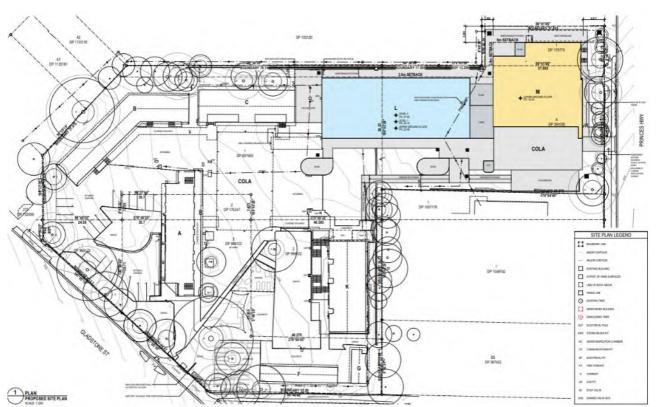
Extract of proposed Site Plan (Fulton Trotter, 2024)
